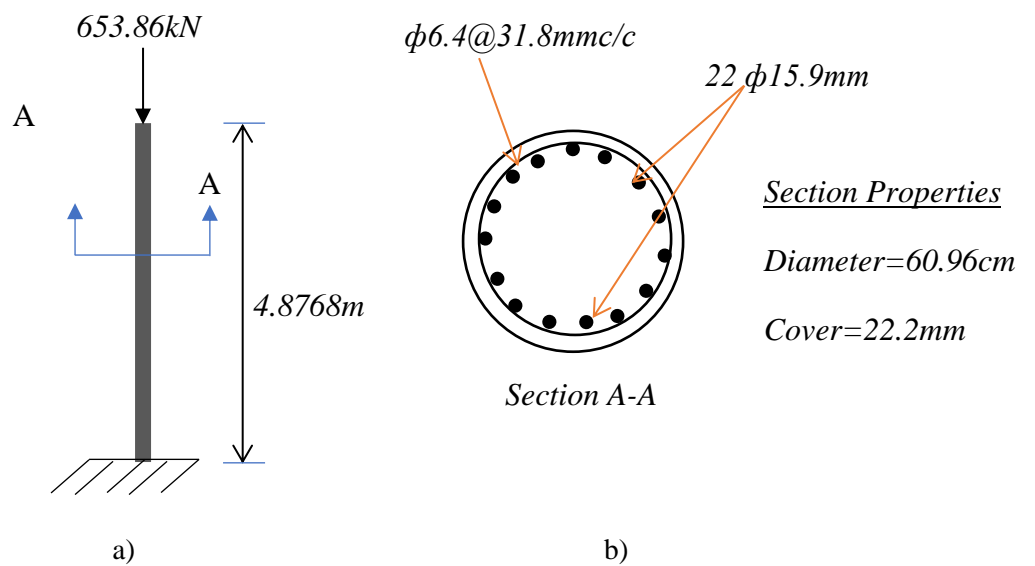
Geometry and loading condition (a) section properties (b) of the column
